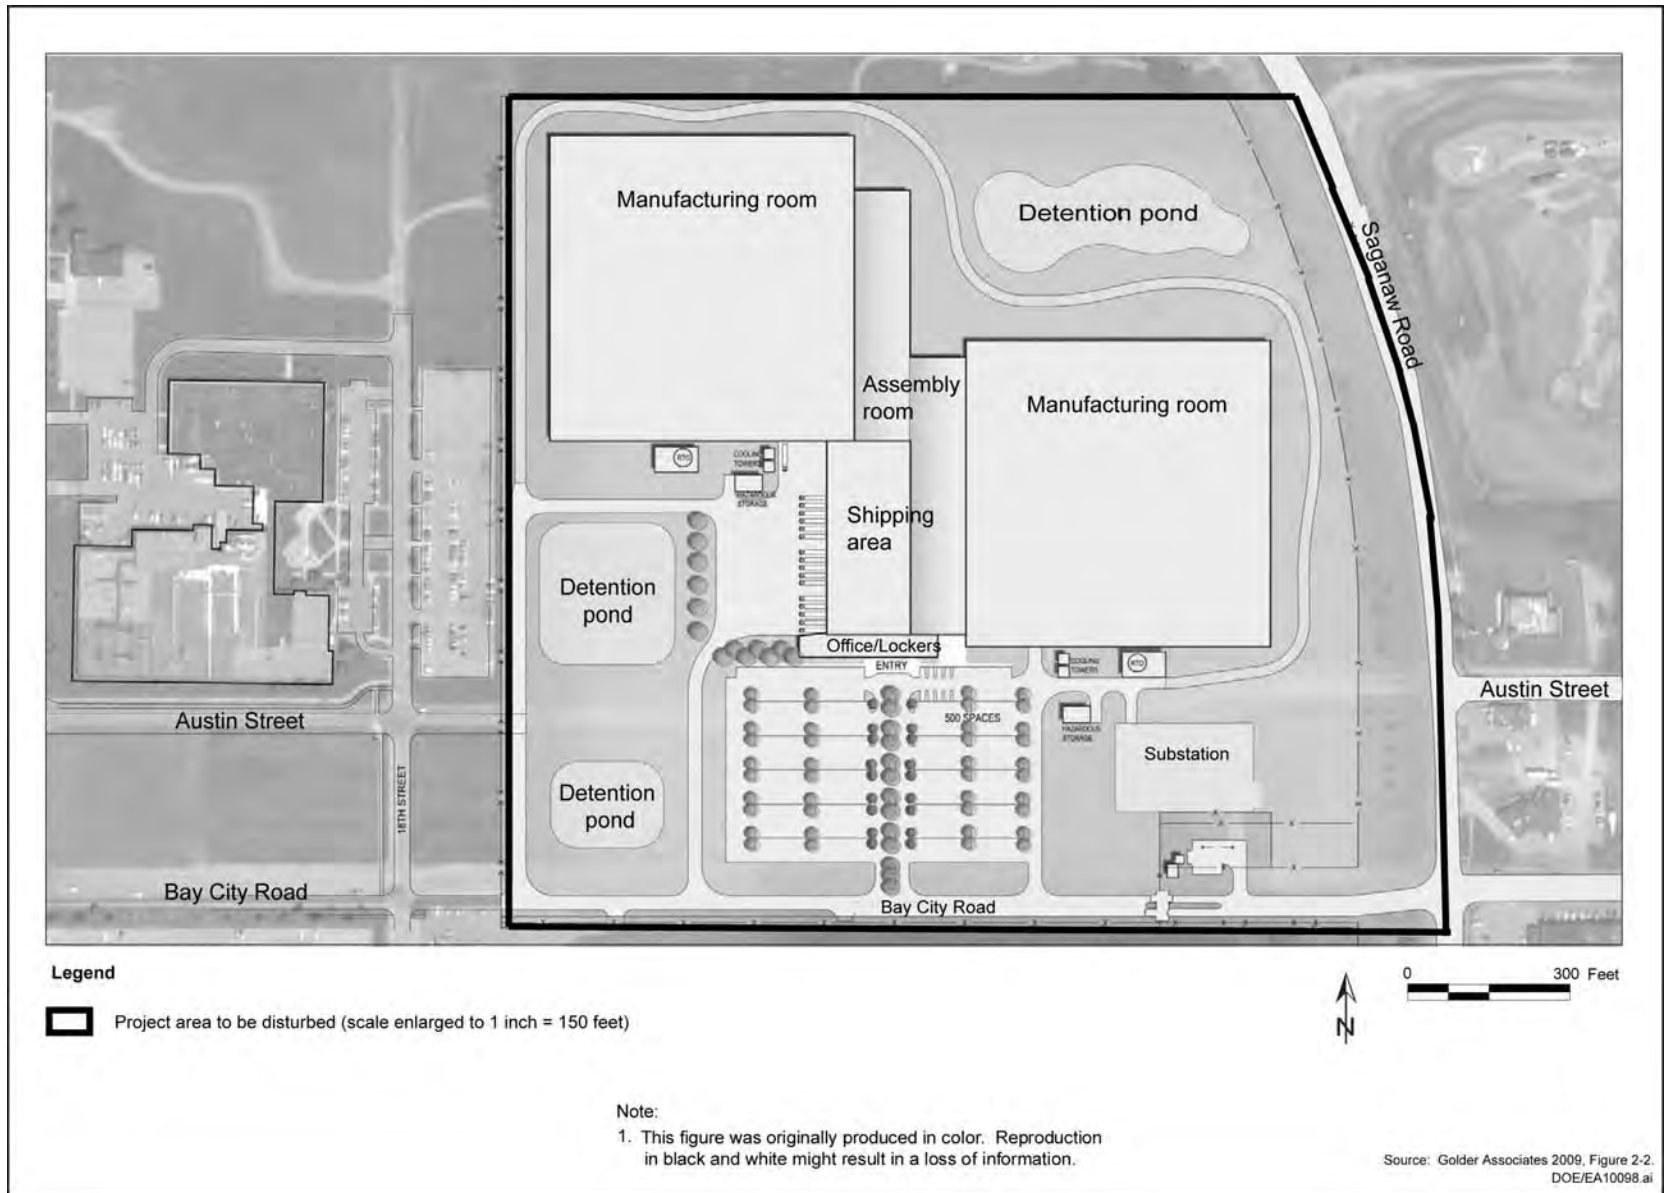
Conceptual layout of facilities at the Midland Battery Park.
